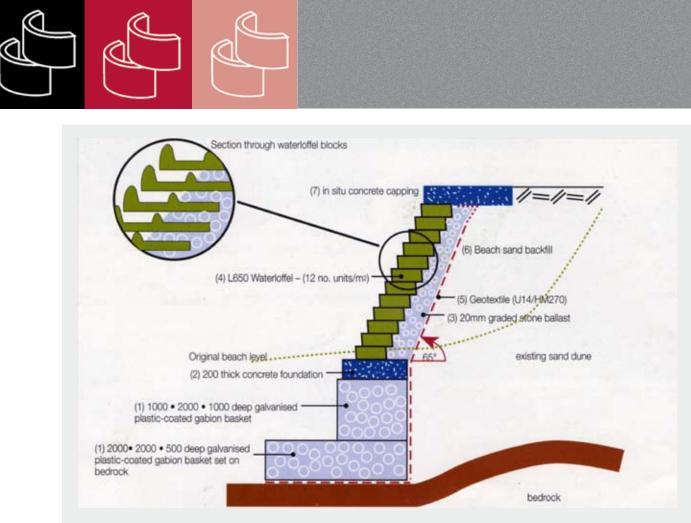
Typical section of Waterloffel wall used for coastal protection on Natal beaches
